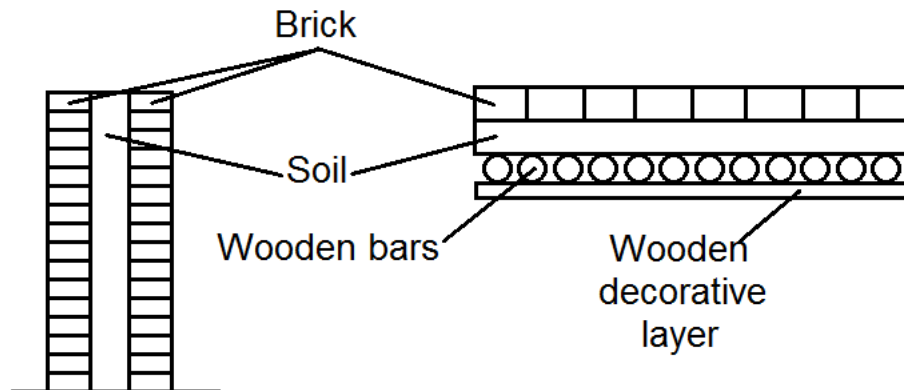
Old Iraqi dwelling wall (left) and ceiling (right) intersections show the use of multi-layer naturally insulating materials.
